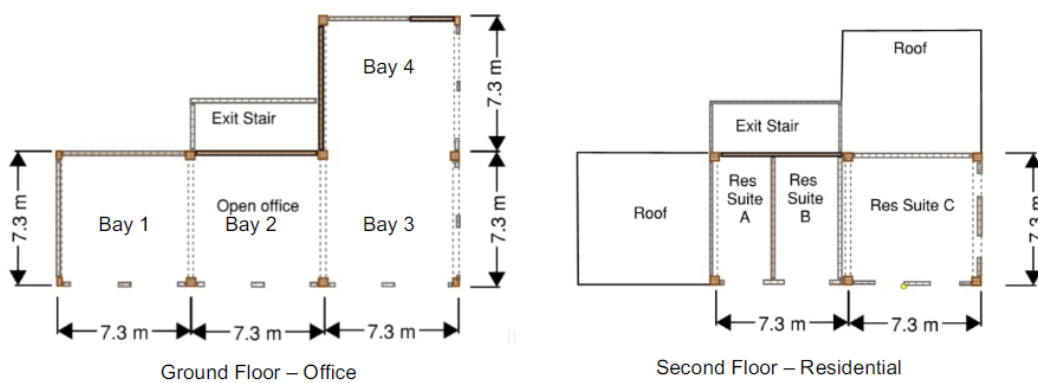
Location of bays in the mass timber structure - plan view (Su et al., 2023)
